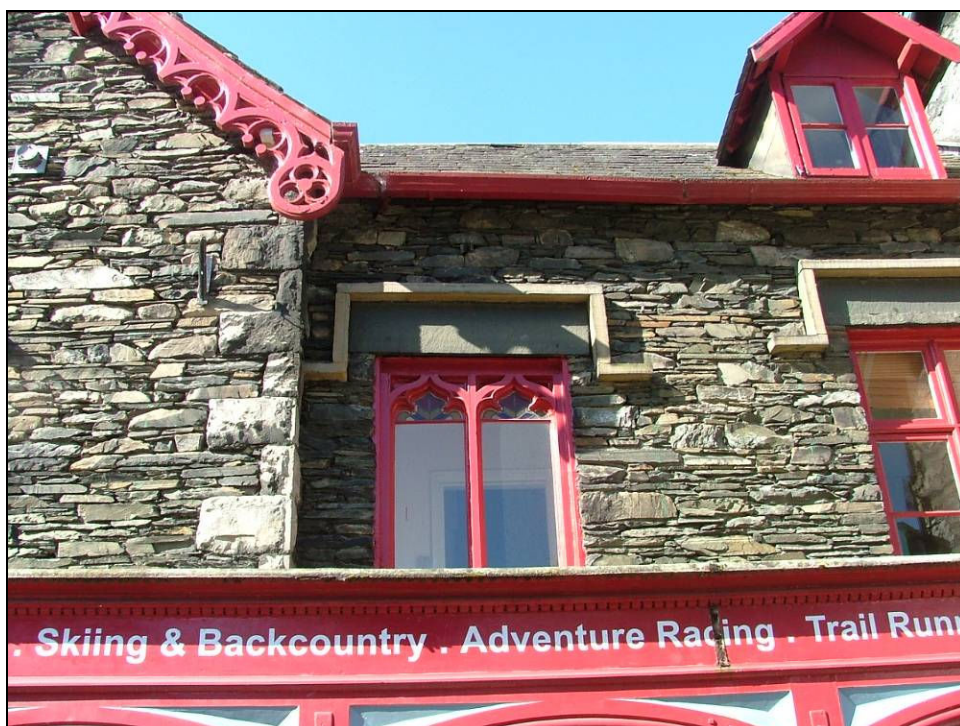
Central first floor window, north elevation, with cusped ogee heads
